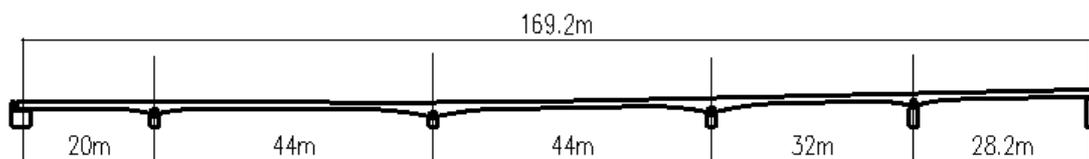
South-west approach viaduct at Haliç Metro Access Bridge.
